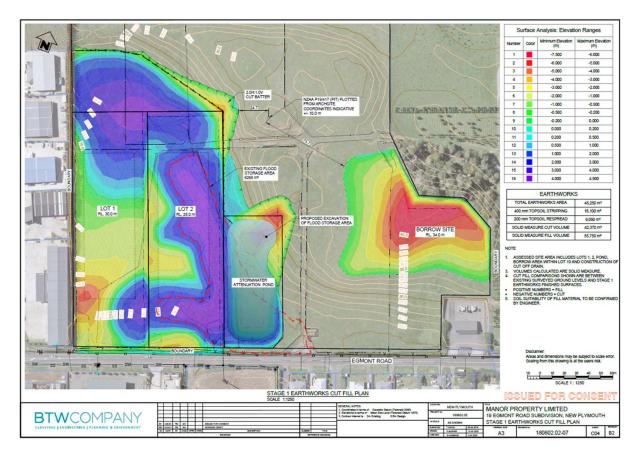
19 Egmont Road – Preliminary Earthworks Plan
